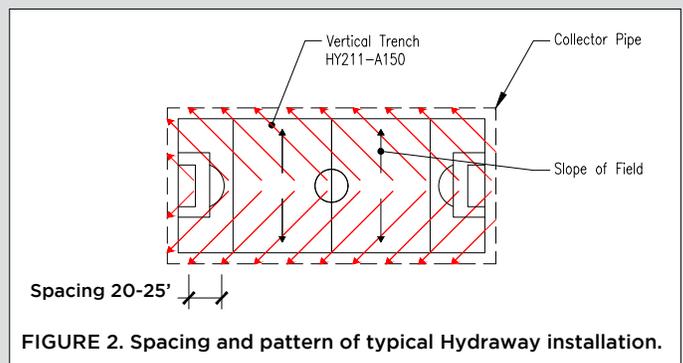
Spacing and pattern of typical Hydaway installation.
